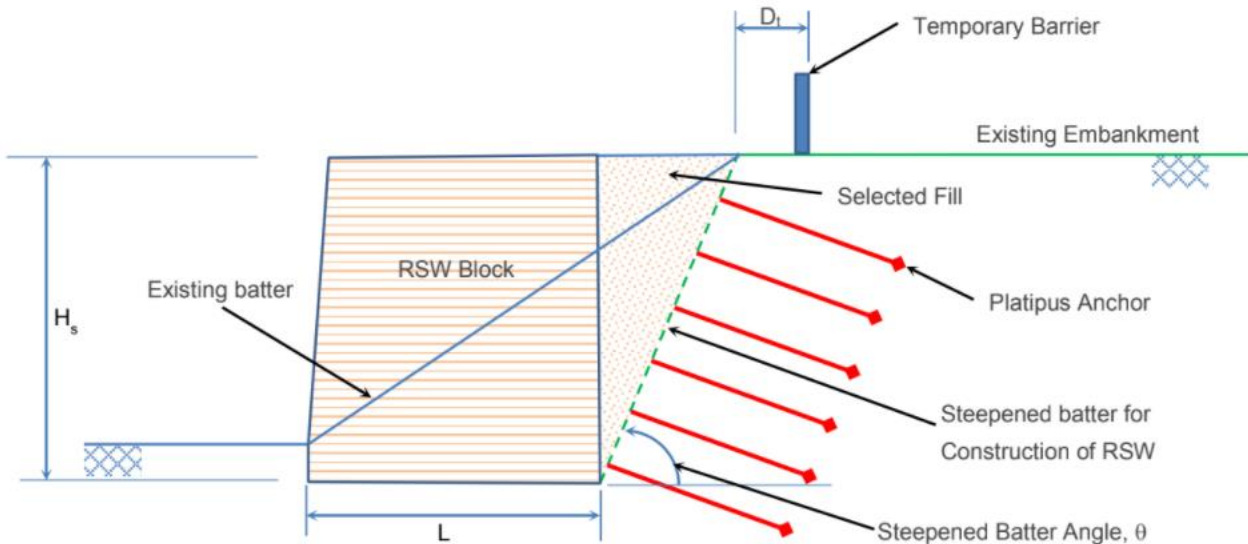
Layout of temporary excavations and anchor arrangements (William and Paramaguru, 2017).
